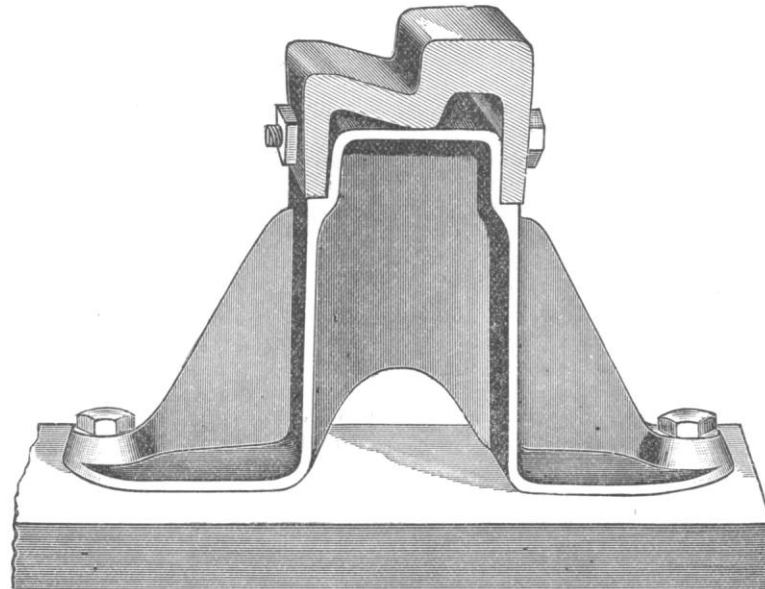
WHITE'S DOUBLE-GIRDER STREET-RAILWAY RAIL.
